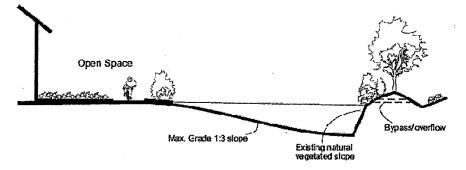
Figure Exception to 20.50.160(A)(2) and (3): Example of stormwater facility design which does not require fencing.
